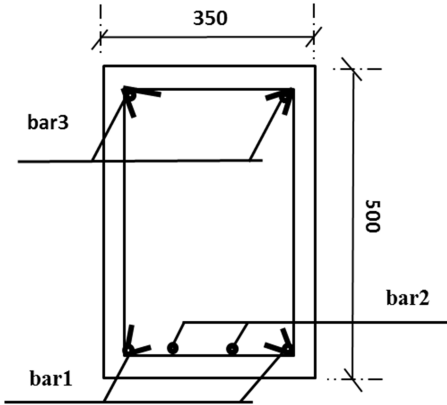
Name and arrangement of the steel bars on the cross-section
